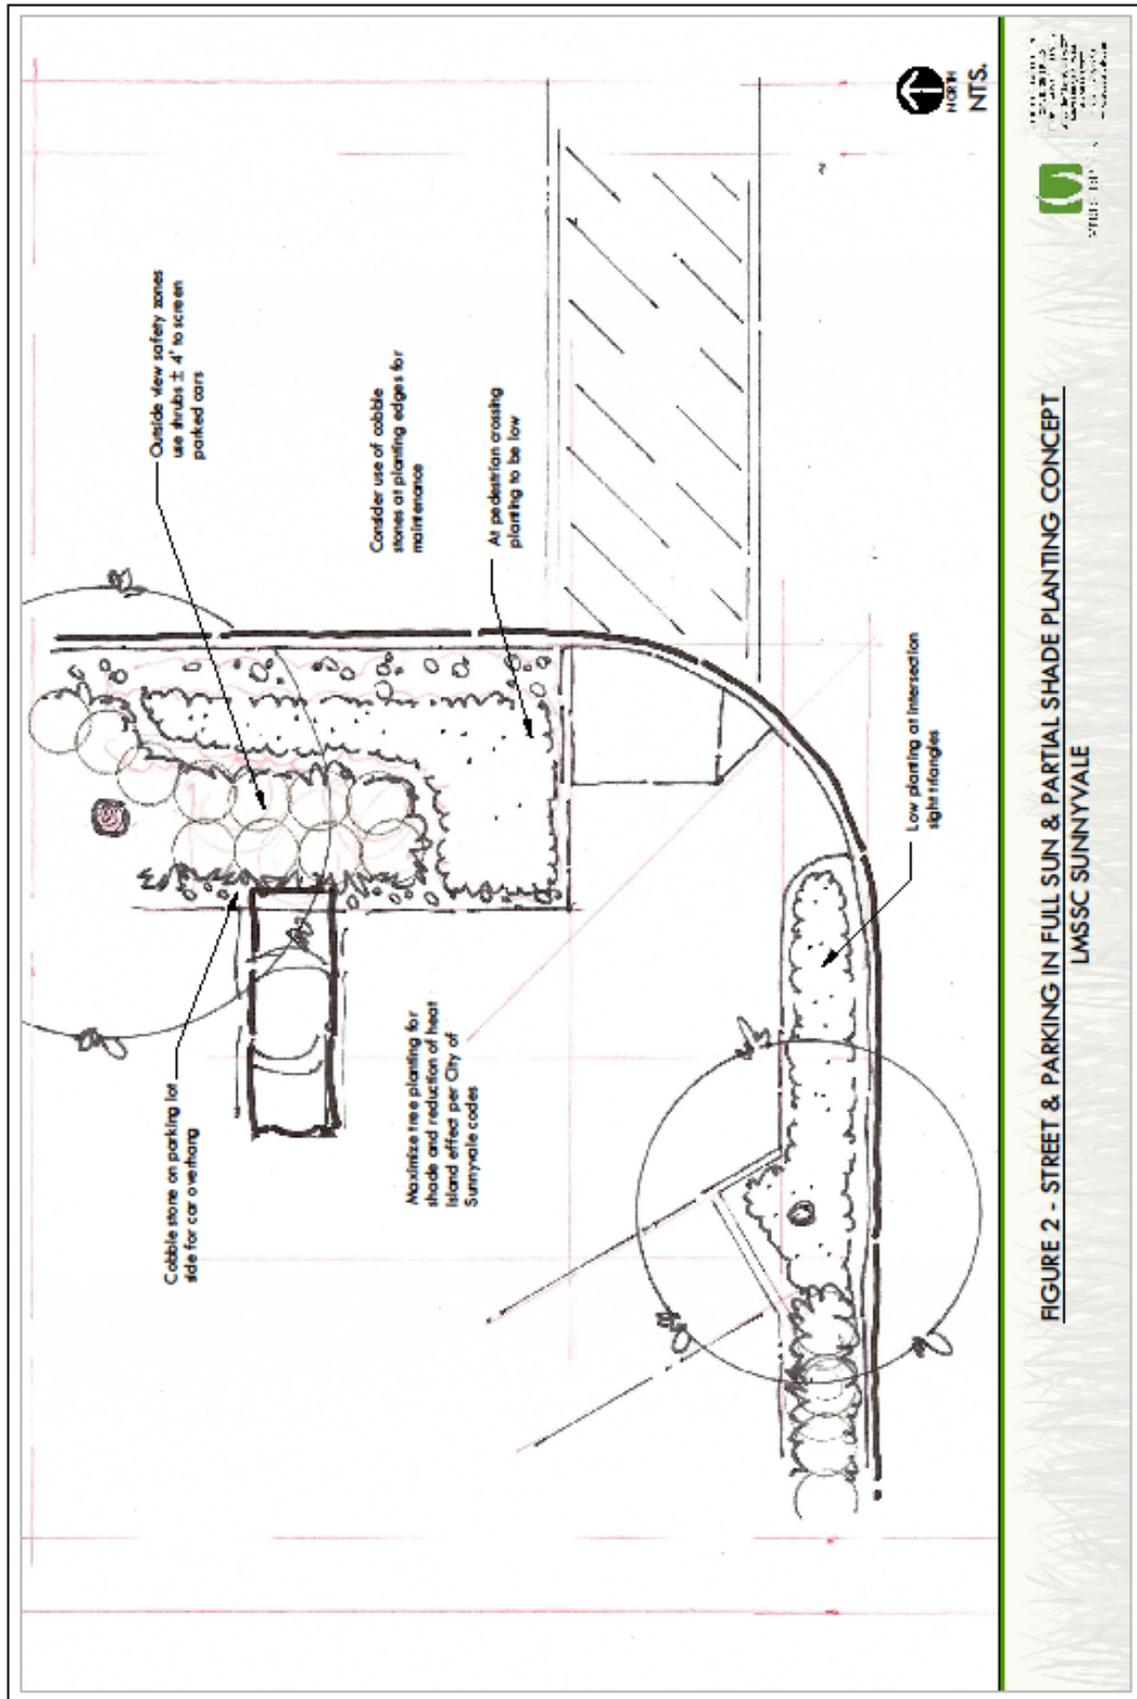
STREET & PARKING IN FULL SUN & PARTIAL SHADE PLANTING CONCEPT
